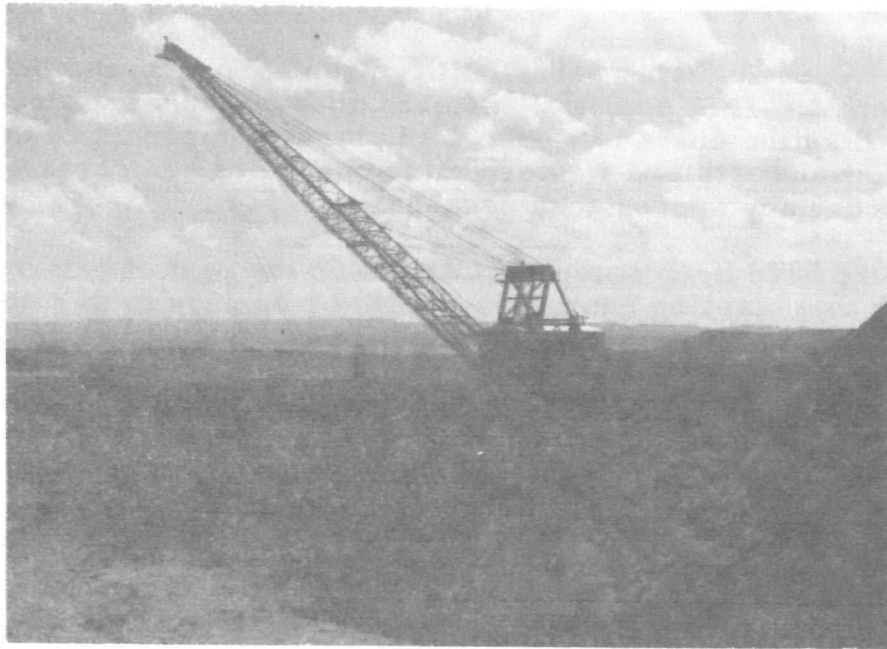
Photograph Showing Dragline Excavating Box Cut Overburden
